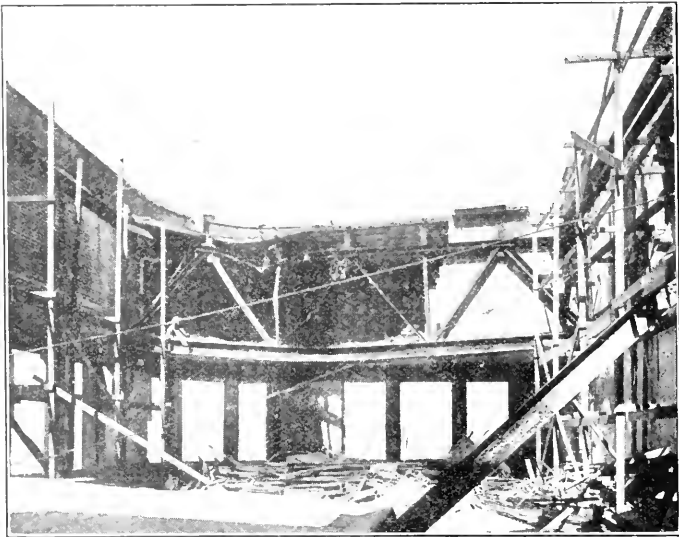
VIEW LOOKING NORTH IN TOP STORY
